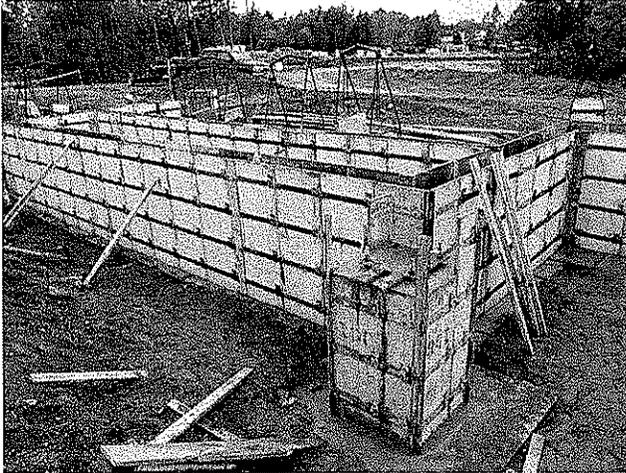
View southwest of the segment D main entry, September 9, 2010.
